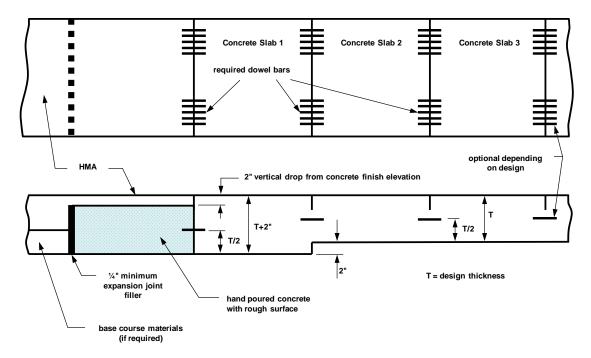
Detail of Asphalt and Concrete Slab Joint
